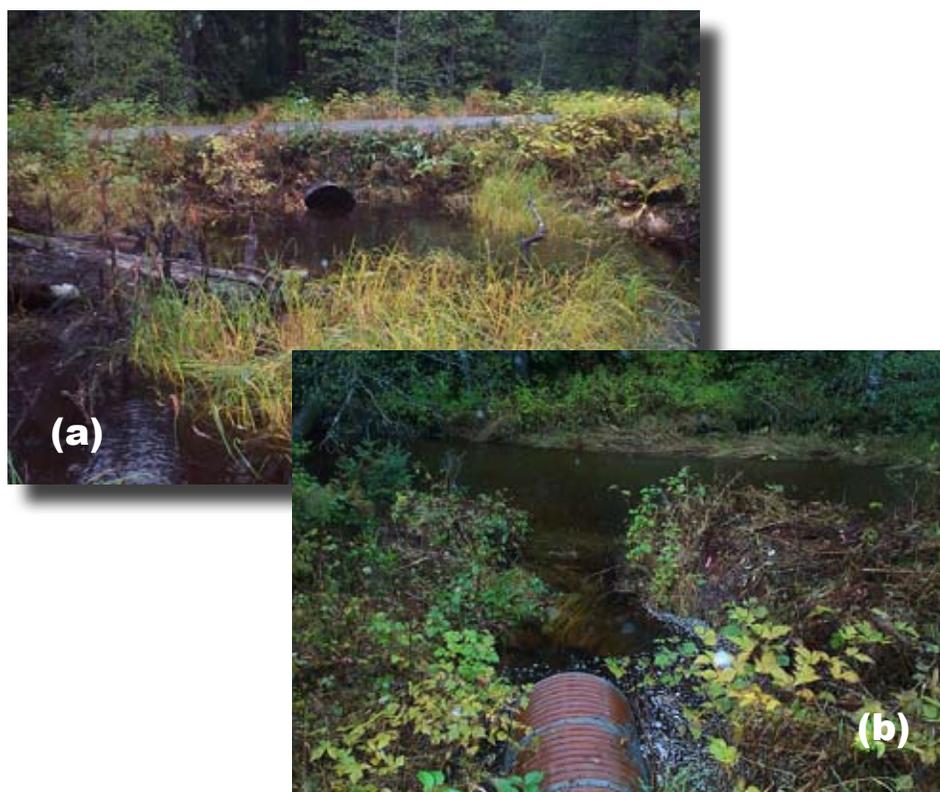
Existing culvert on Road 6235, milepost 17.59 (Tongass National Forest). (a) Culvert inlet. (b) Culvert outlet.
